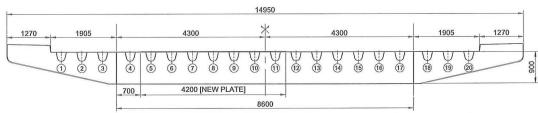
General cross section of Scharsterrijn movable bridge and new plate position (dimensions in mm).
